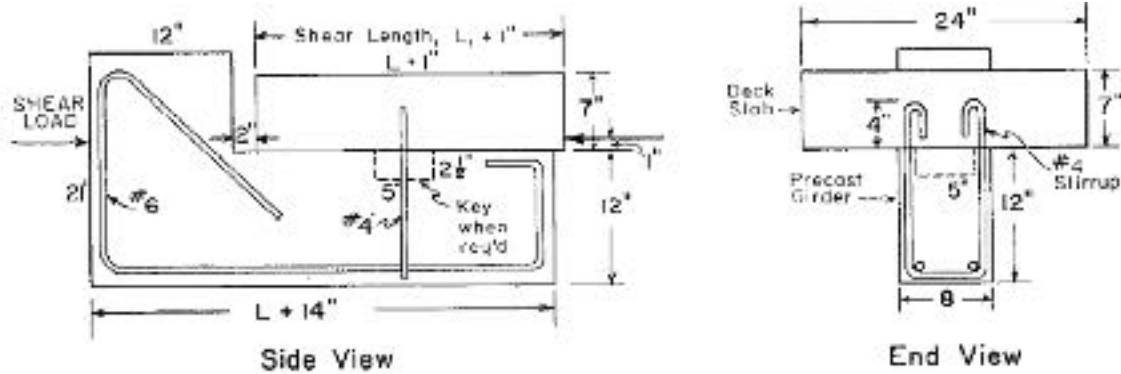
Push-off specimen in casting position for looking at interface between beam and composite deck (Hanson, 1960).
